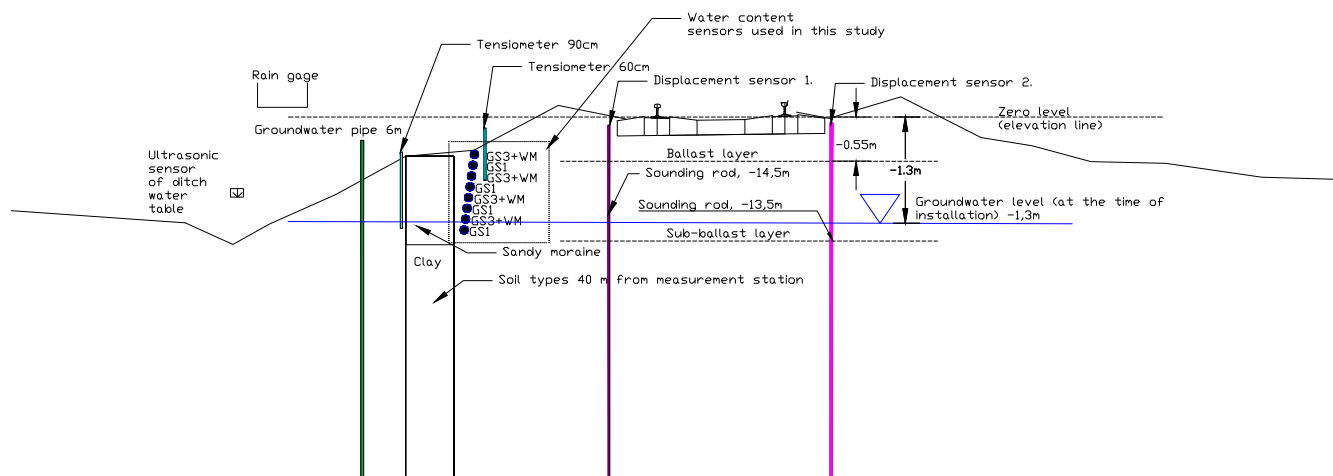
An example of installed measurement instruments in track cross-section (Km 98).
